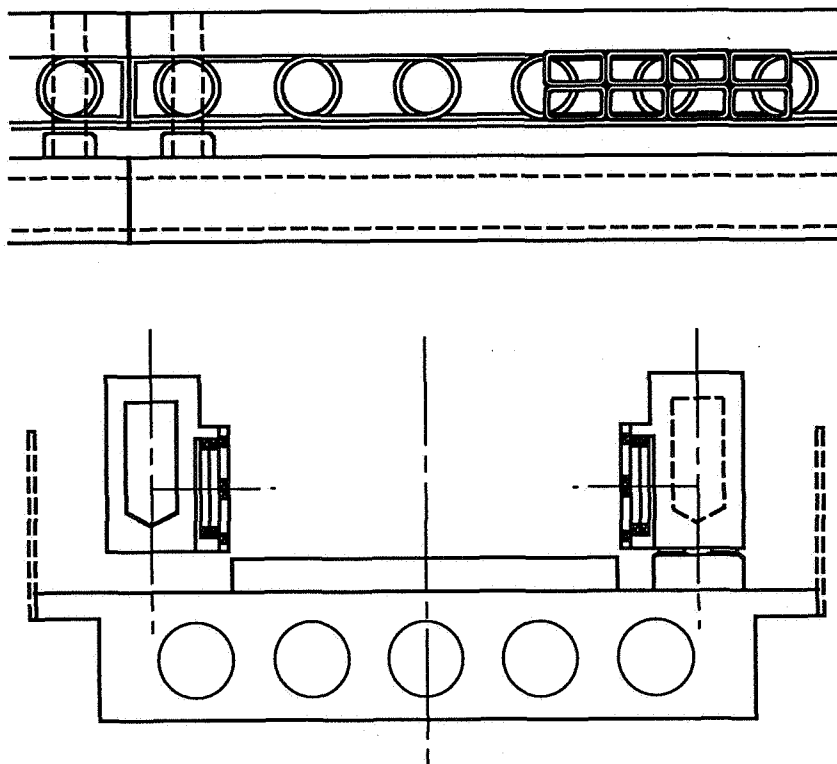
Miyazaki Guideway Converted to Side Wall Levitation System
